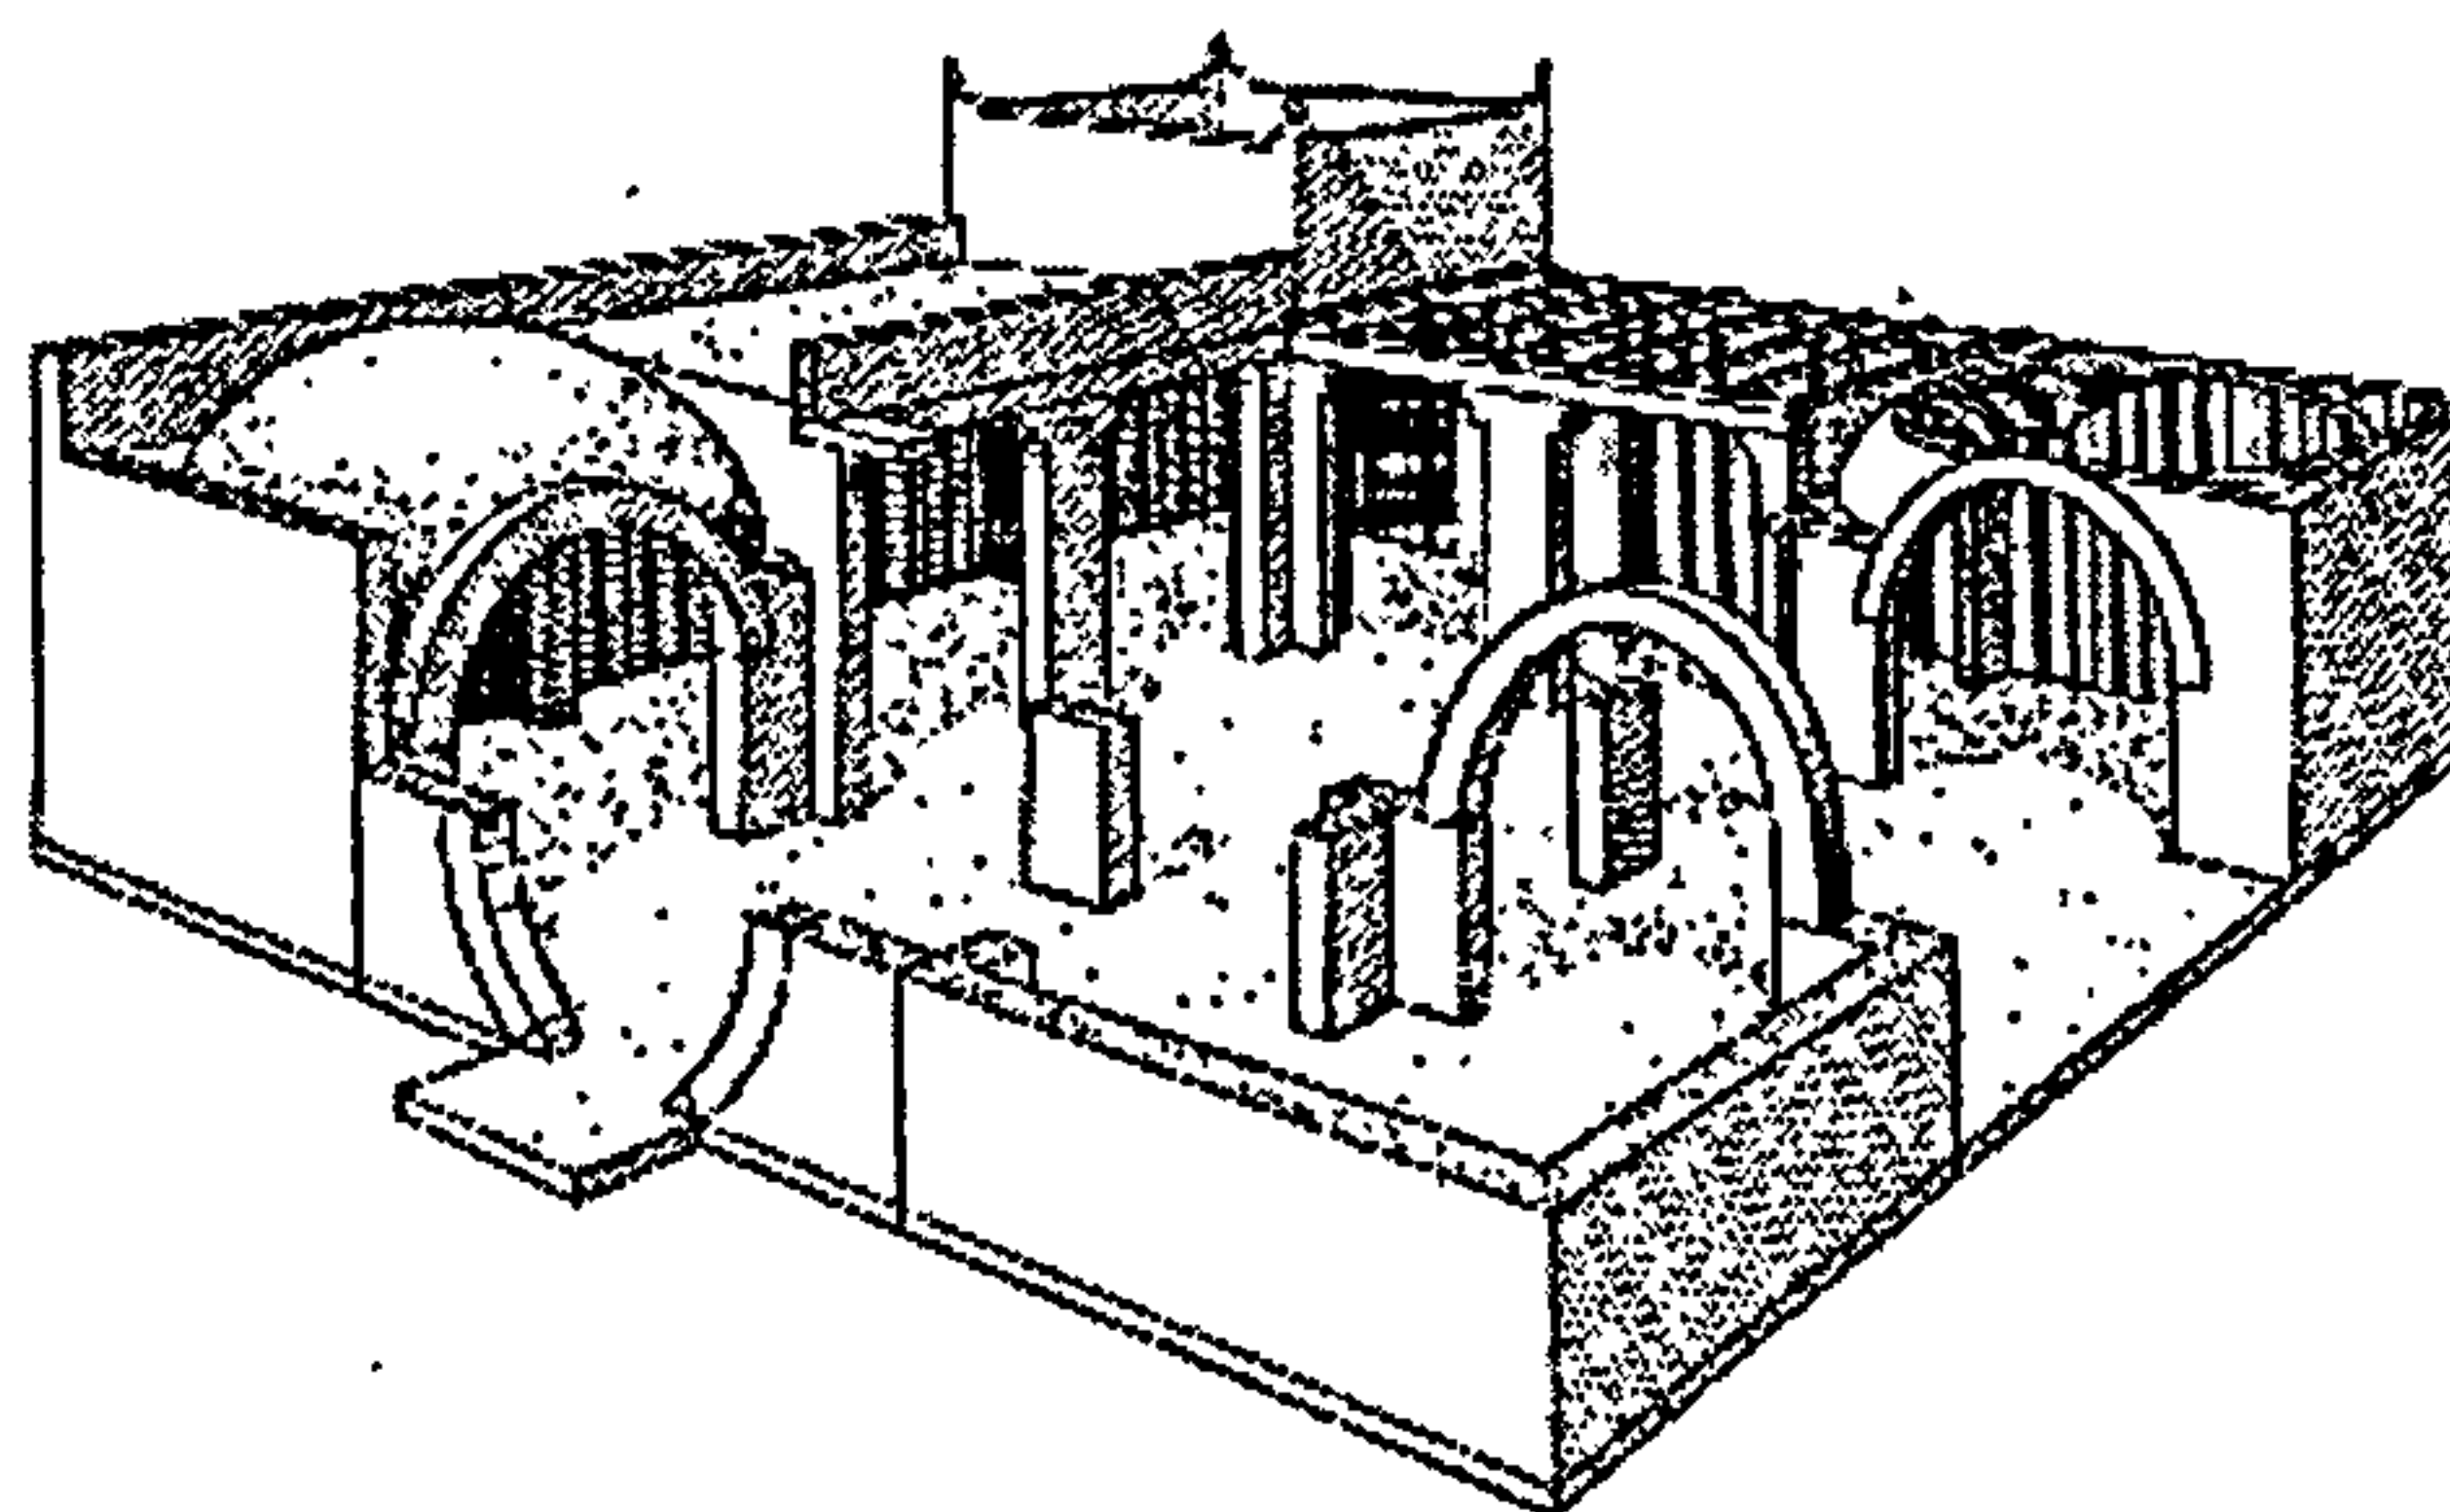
Elevation of Exhibition Pavilion in Saudi Arabia (11)
